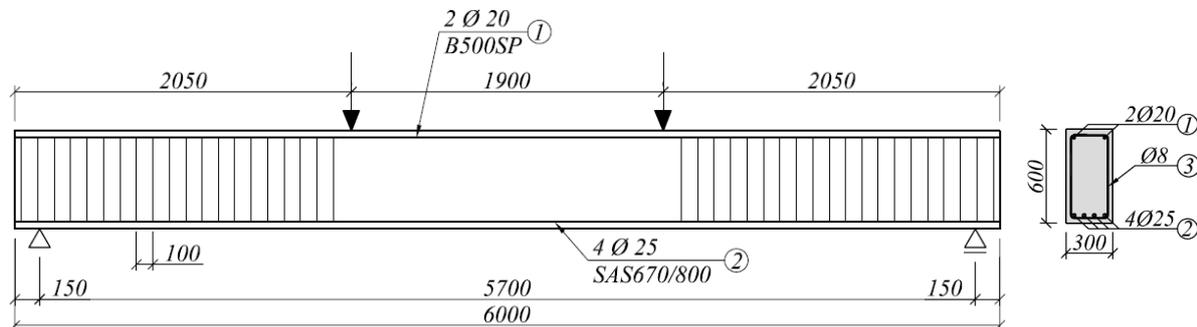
Geometry and reinforcement of the beam (dimensions in mm)
